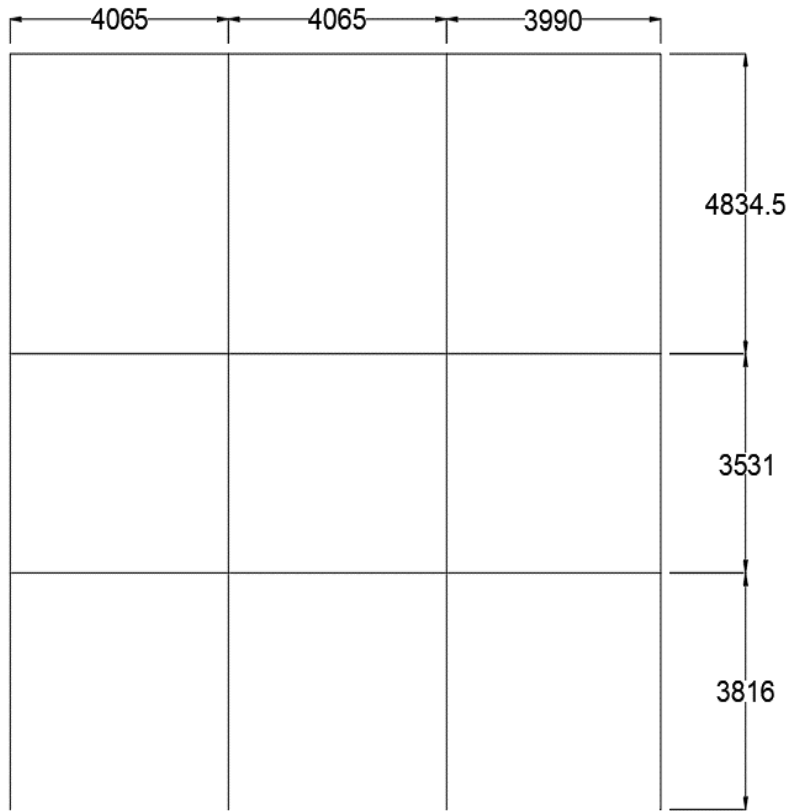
Simple frame diagram for south facing glass curtain wall. All dimensions in mm.
